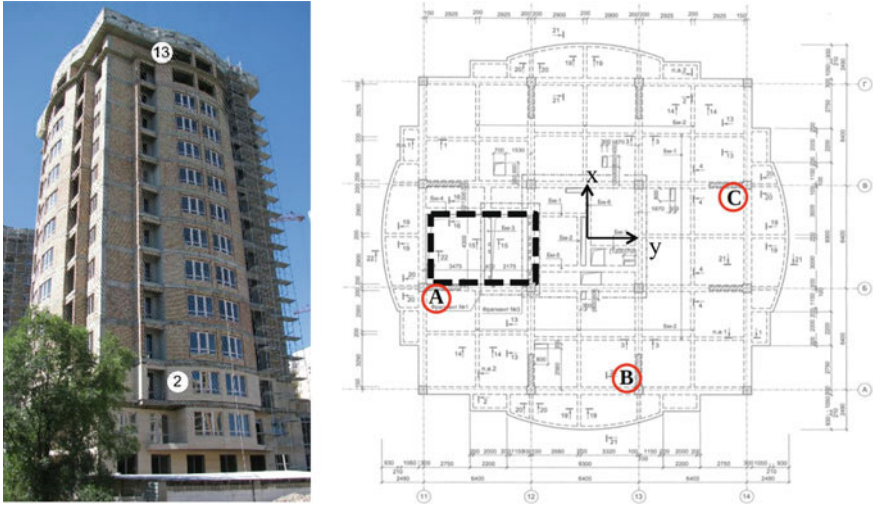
Left: 14-story RC building in Bishkek, Kyrgyzstan. Right: Floor layout (image from project: Earthquake Model Central Asia)
